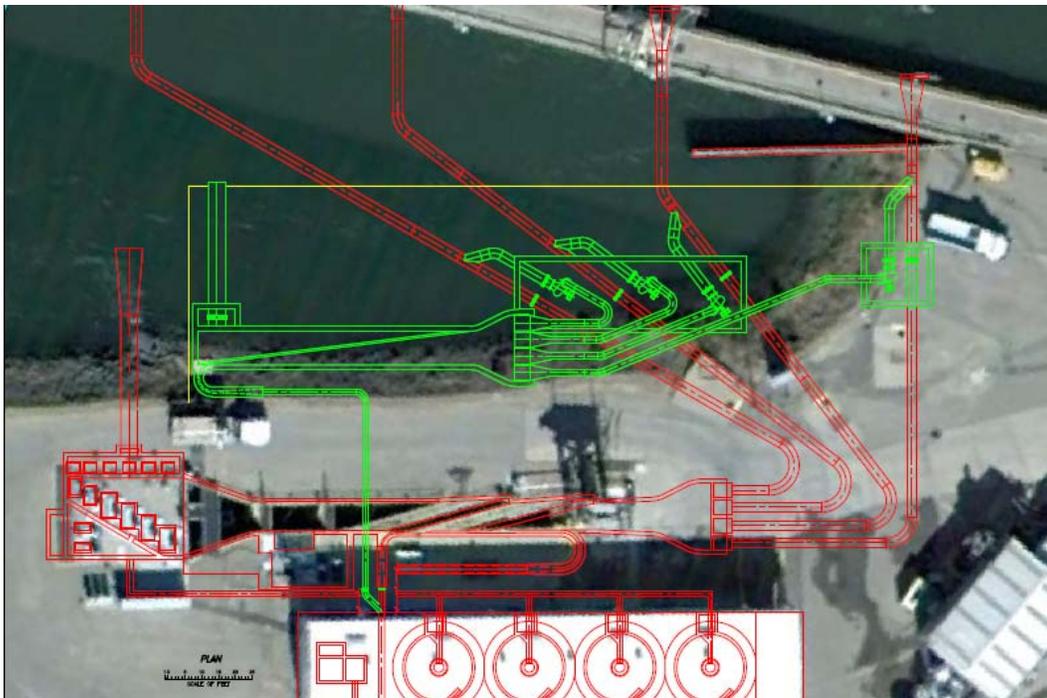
Layout of Alternative 2 at existing TFCF site. Proposed pumps, vaults, and new secondary are shown in green; proposed cofferdam shown in yellow; and existing infrastructure shown in red
